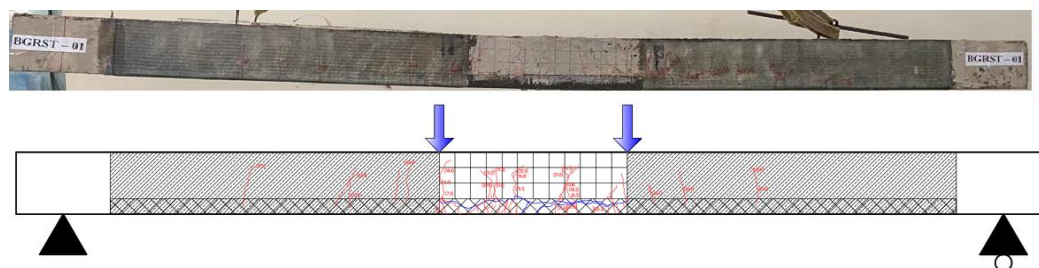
Crack Pattern of RBGT Concrete Beams
